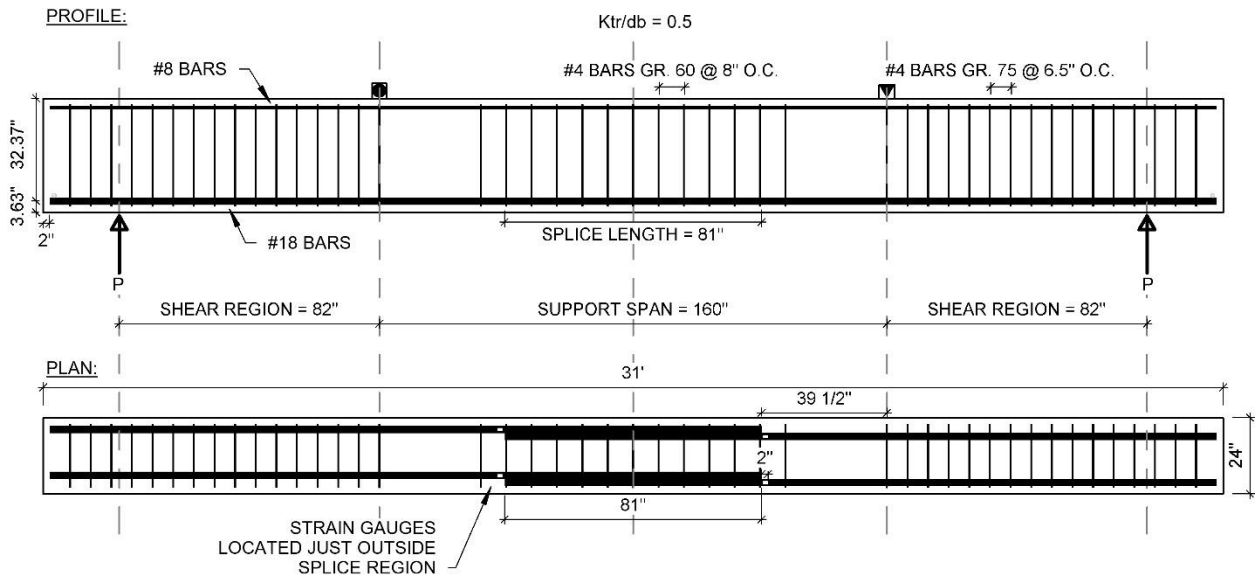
Profile and plan of 18-a (1 in. = 25.4 mm)
